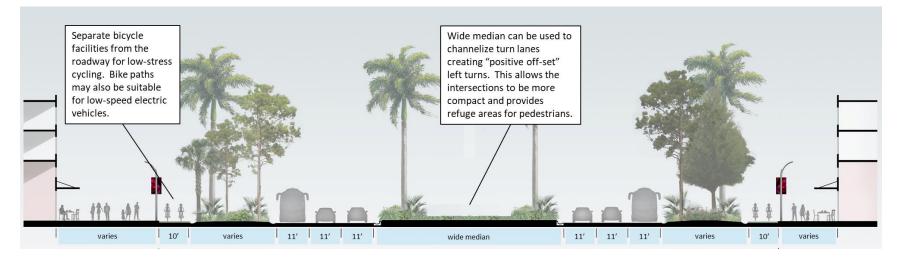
Proposed US 41 Cross Section – Rattlesnake Hammock Road
